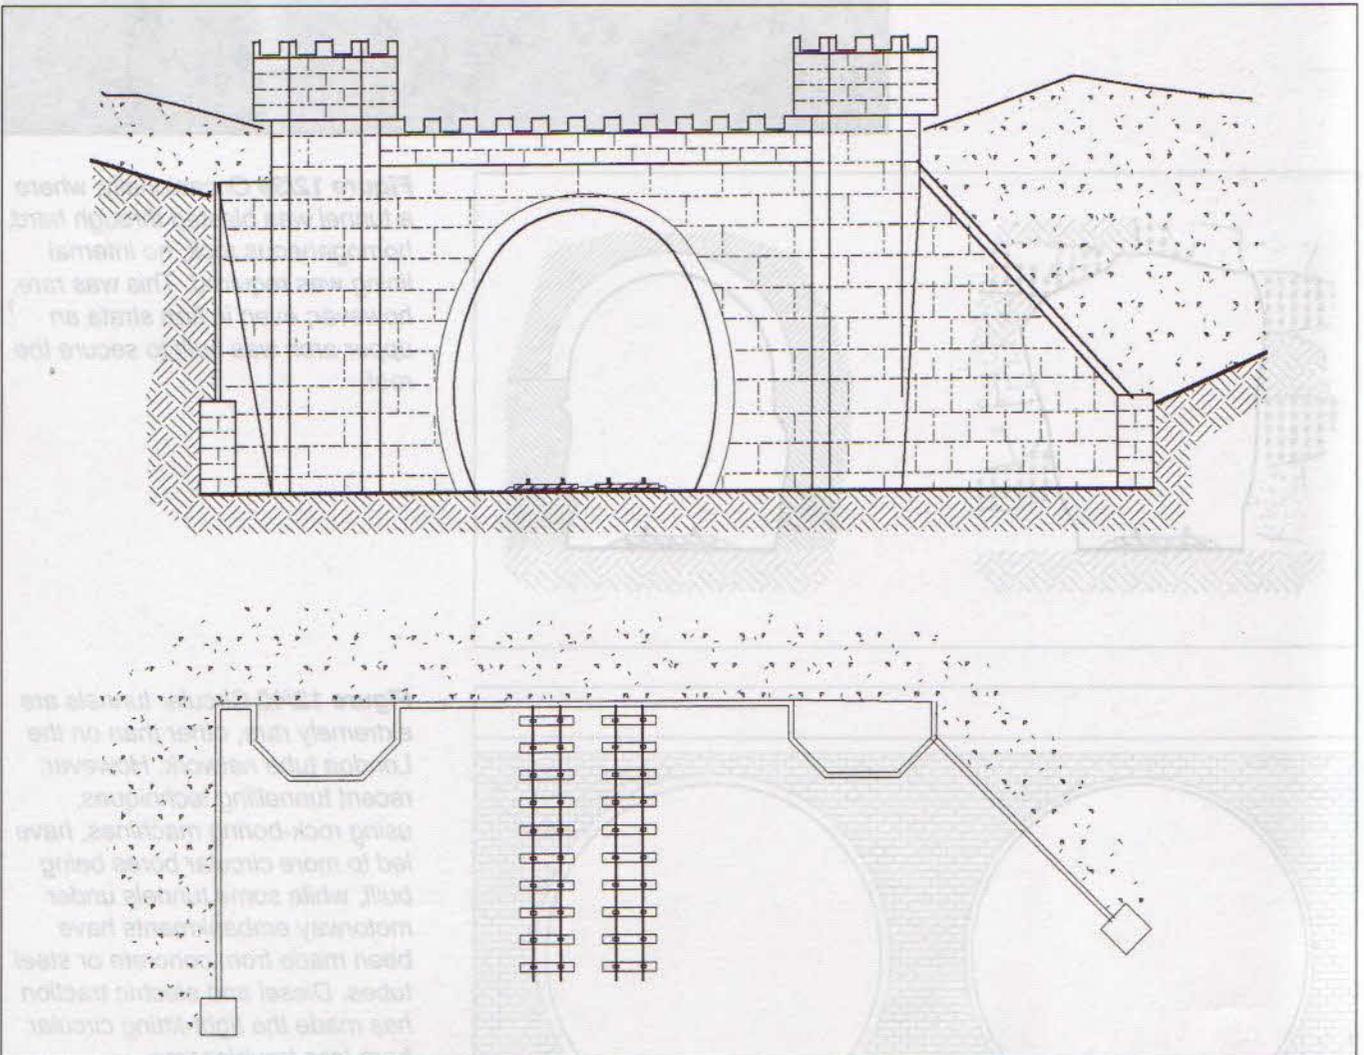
/38 Although the castellated tunnel facade appears little more than a folly, in practice this design, with its dummy towers, formed an extremely strong structure to hold back loose ground. That few people could see such structures seems not to have deterred early engineers.
